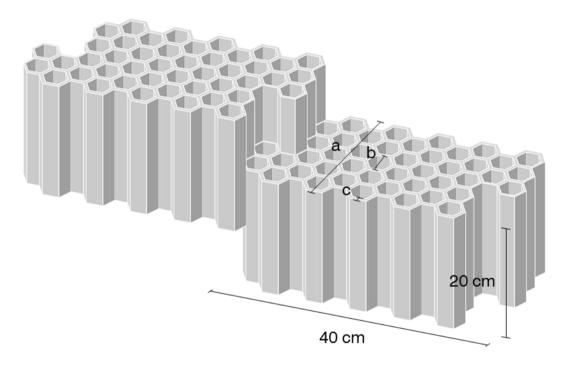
3D printable block with honeycomb geometry and possible assembly system. The dimensions show constant and variable geometrical parameters of the 3D printable envelope block: (a) number of hexagonal cells; (b) hexagonal cell size; (c) wall thickness.
